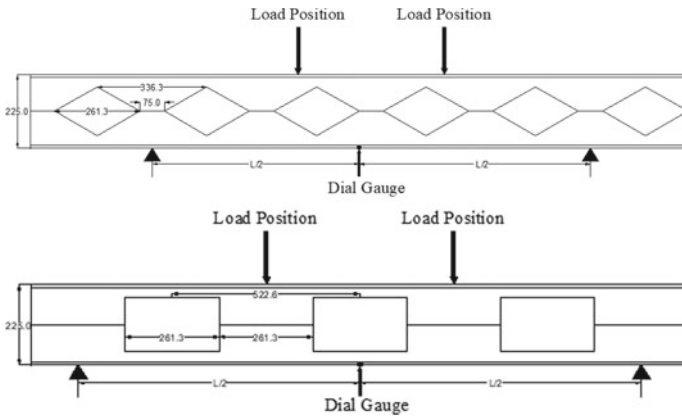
Two-point loading and dial gauge in castellated steel beam with diamond and rectangular openings
